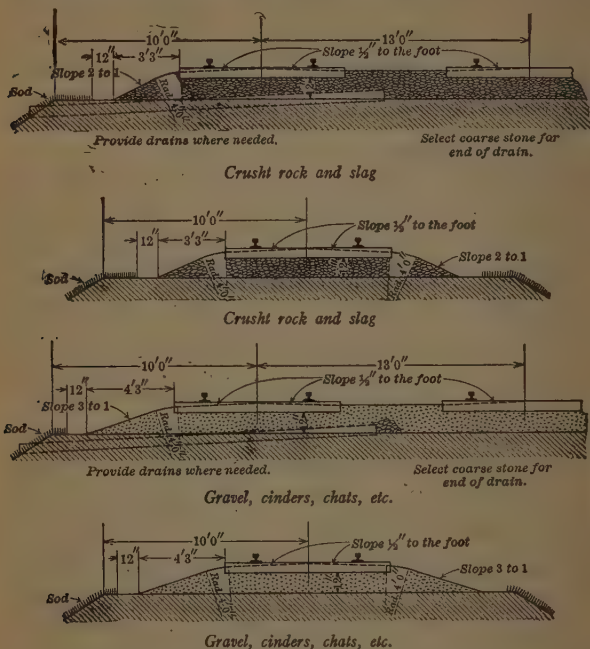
Standard Railroad Cross-Sections, Class A Track
